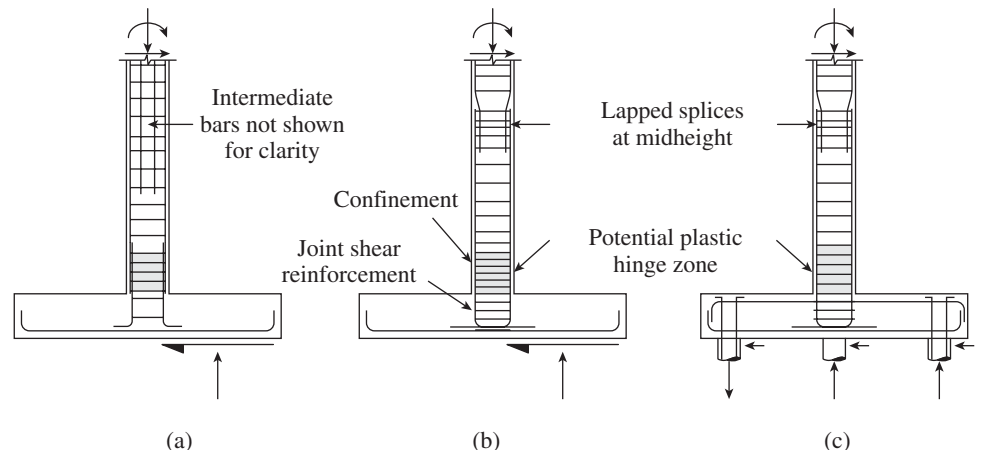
Seismic design considerations for footings (a) Conventional wrong detail for footing (b) Correct detail for footing (c) Detail for pile cap
